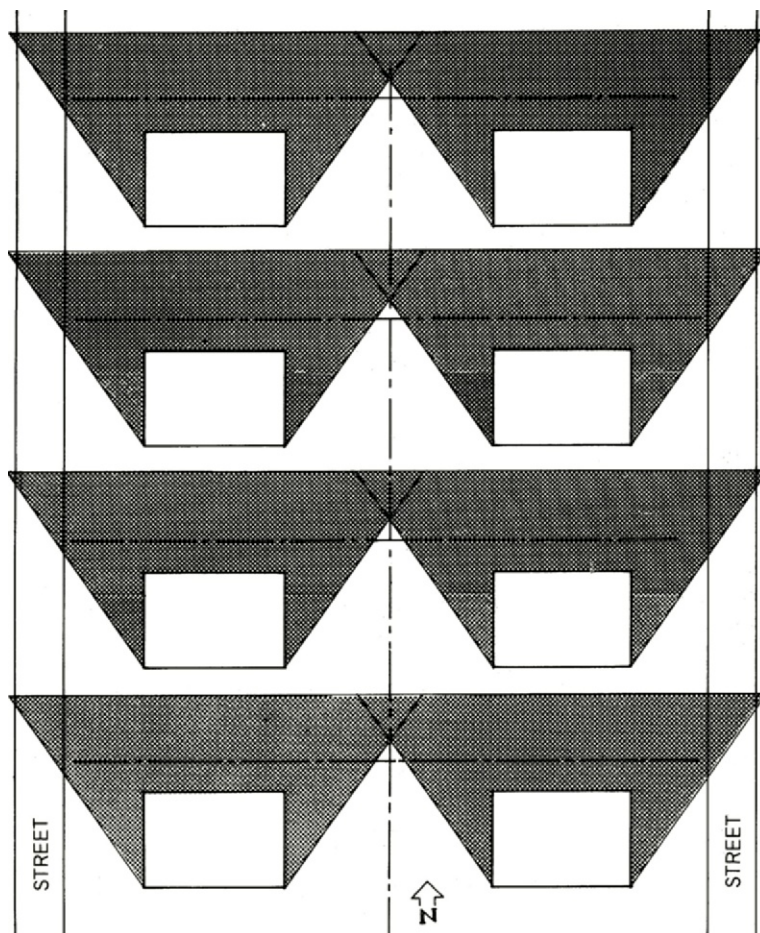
Buildings on north-south streets should have their narrow facade face the street.
